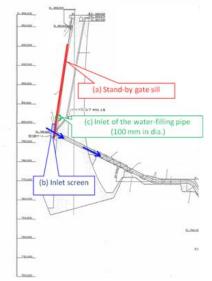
Inspection Point at the Yagisawa Dam (1): (a) Stand-by gate sill of the outlet conduit of the Yagisawa Dam, (b) Inlet screen, (c) Inlet of the water-filling pipe
